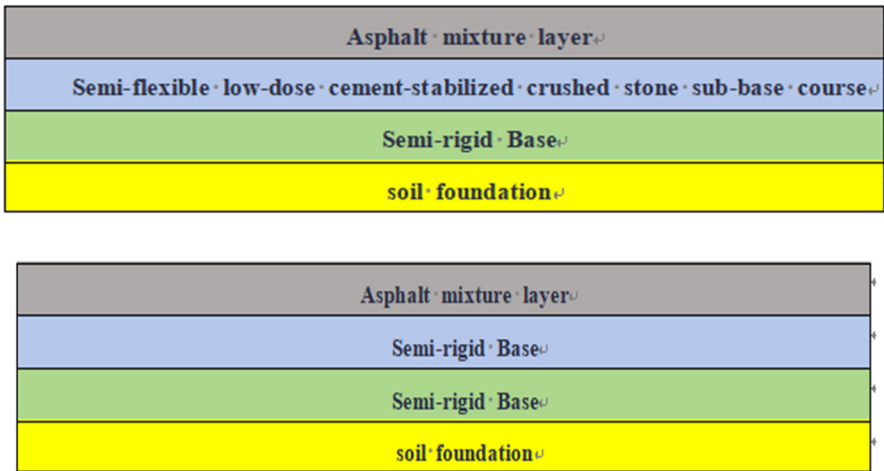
Pavement Structures of High-grade Highway for Structures 3 and 4
